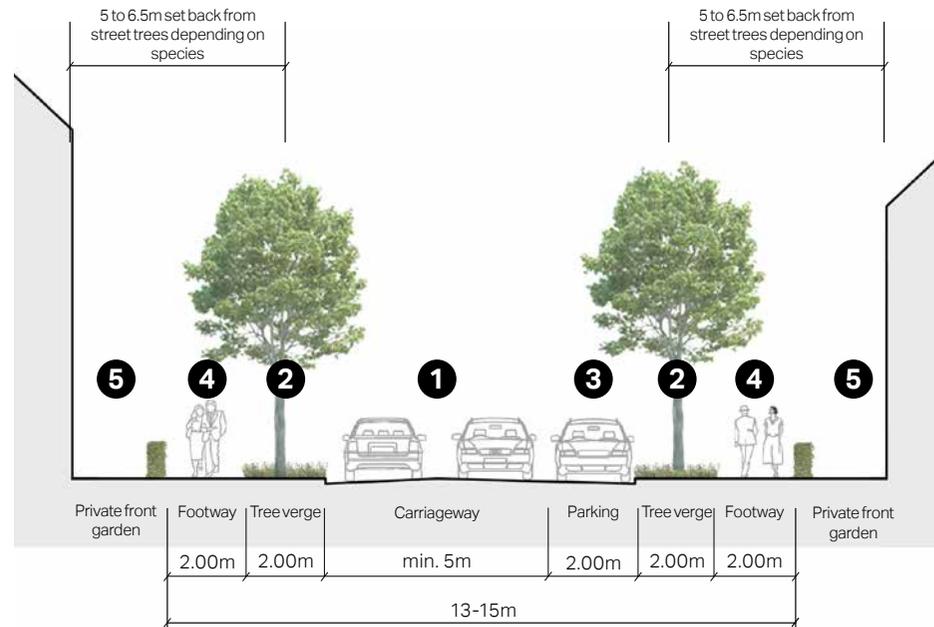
Cross-section to illustrate some guidelines for secondary streets.
